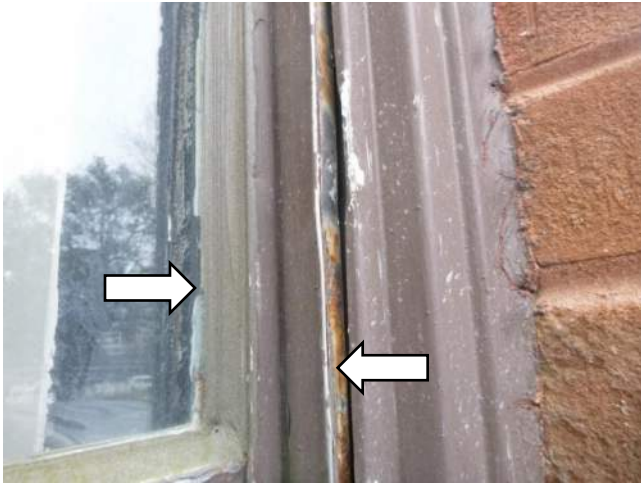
View of a single height ganged window on the first floor of the east elevation.
